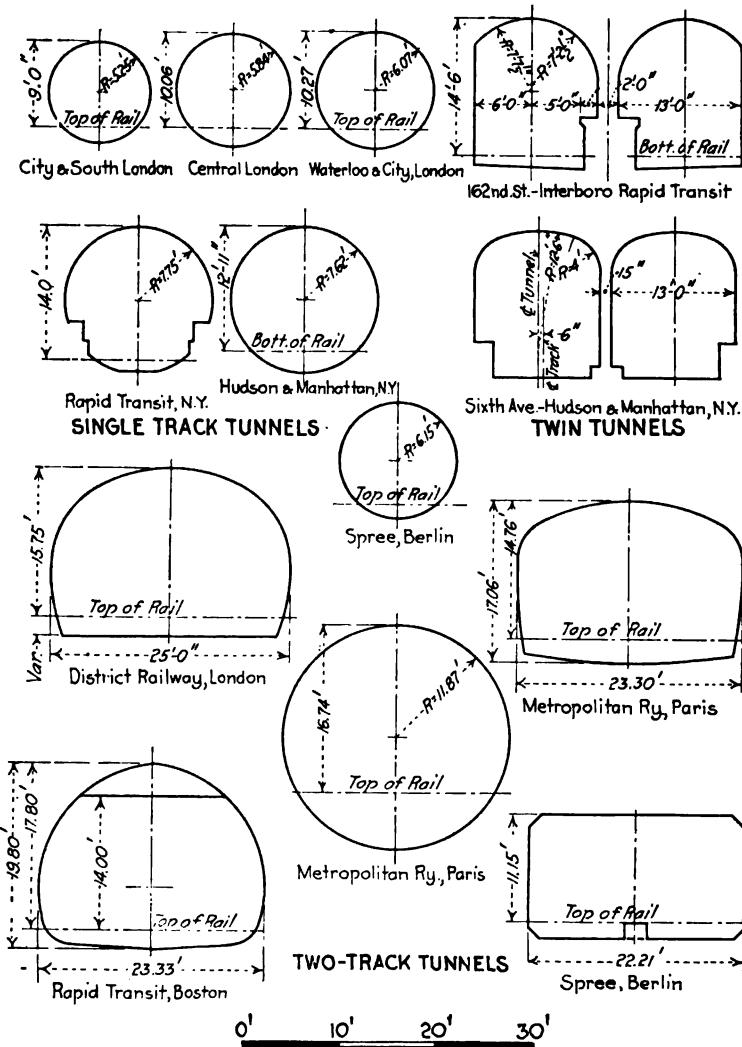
Cross sections of rapid transit railroad tunnels.
